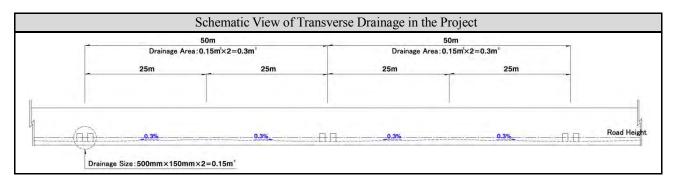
Size and Installation Interval of the Transverse Drainage
